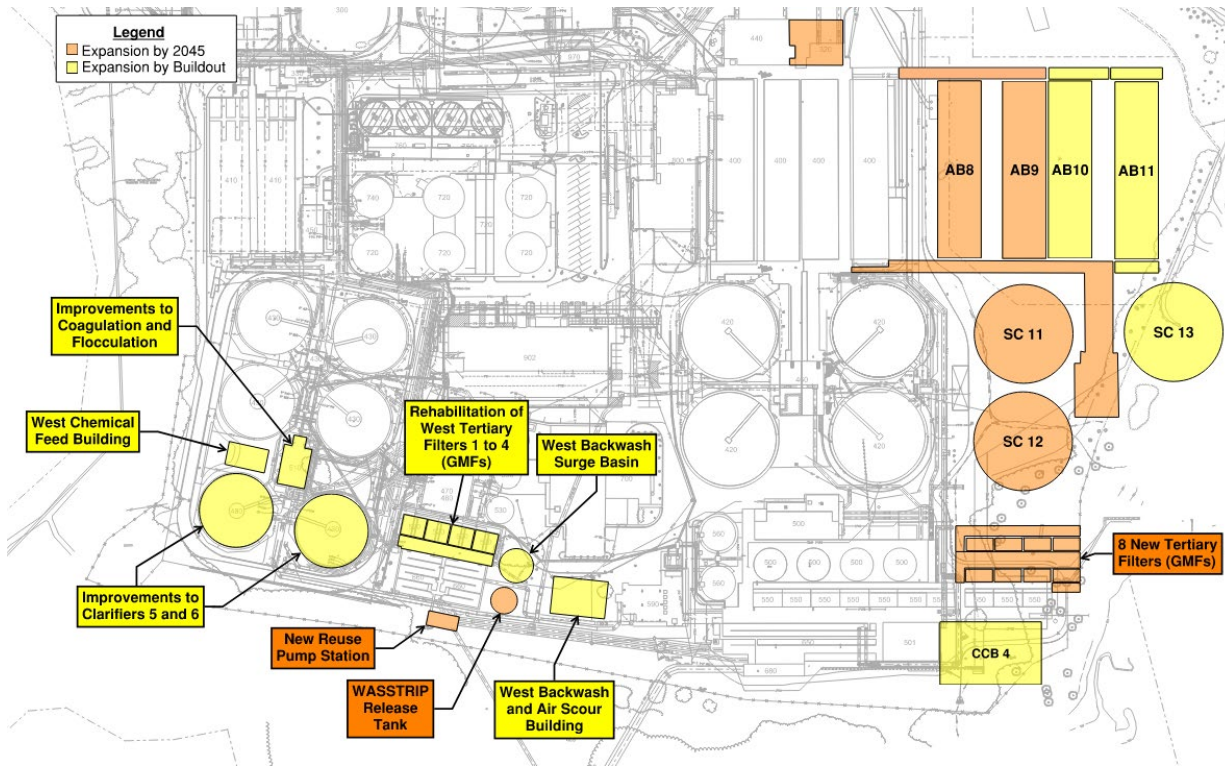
Site Plan for GMF Expansion to Meet Scenario C
